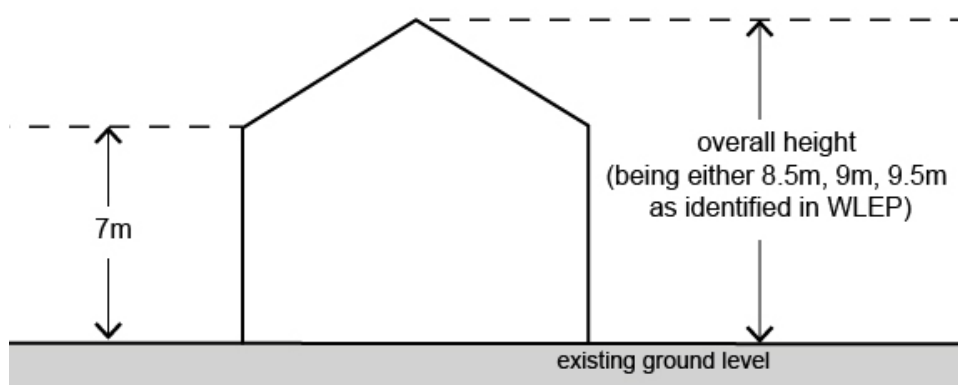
How to measure external wall height for dwelling houses with pitched roofs
